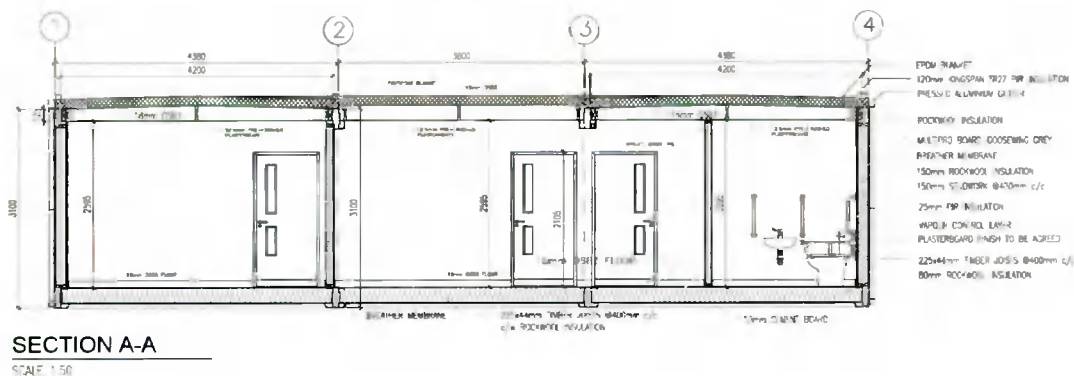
Elevation of the proposed cabin (Scott Tallon Walker)
